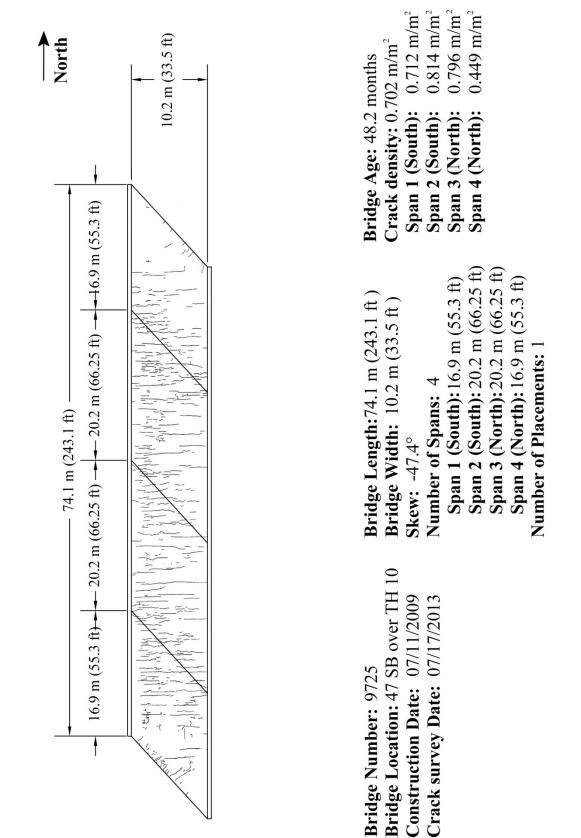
Crack survey of Bridge 9725 (MN LC #1) at 48.2 months of age
